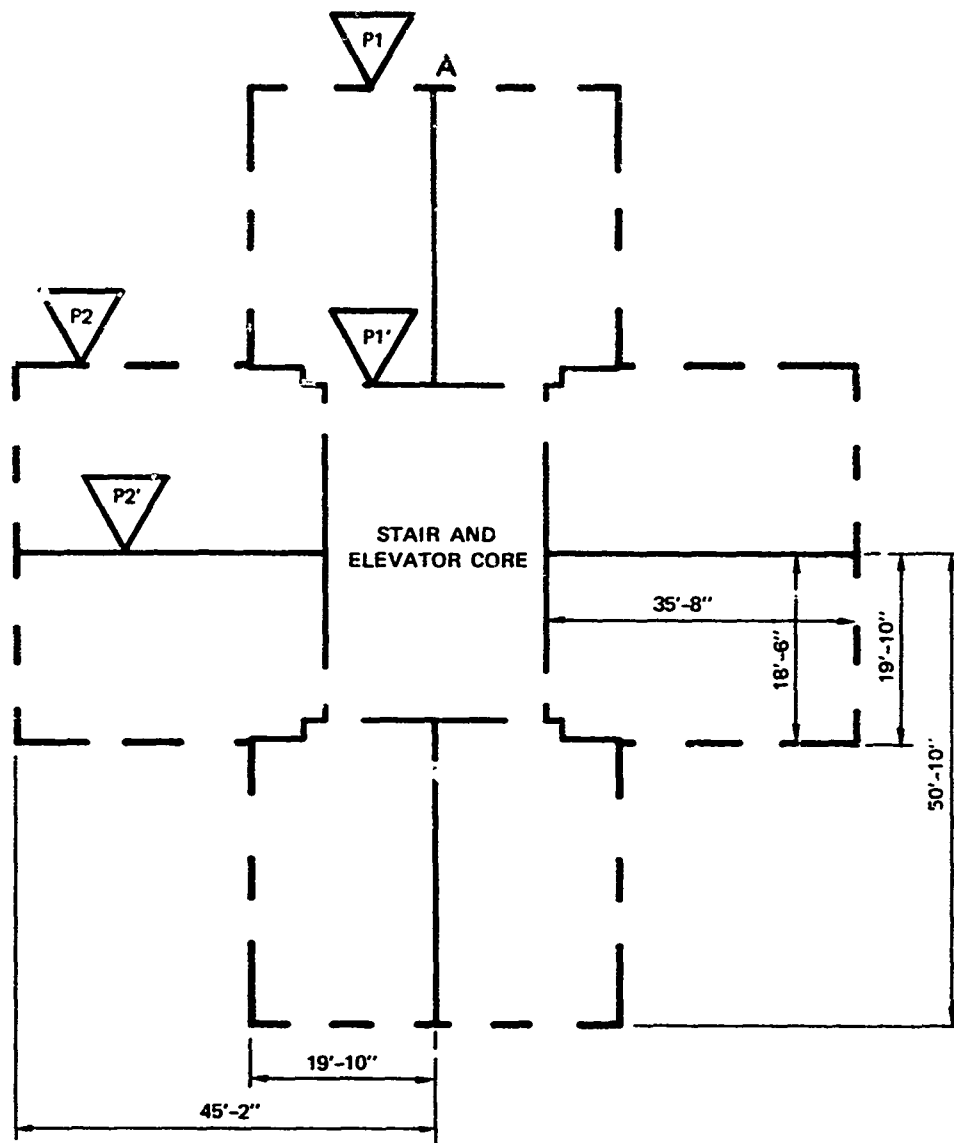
PLAN VIEW OF INTERIOR WALLS ON UPPER STORIES
